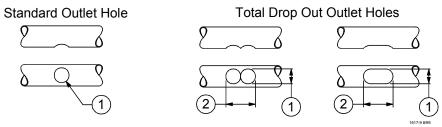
Cutting the Outlet Hole in the Fill System Pipe
